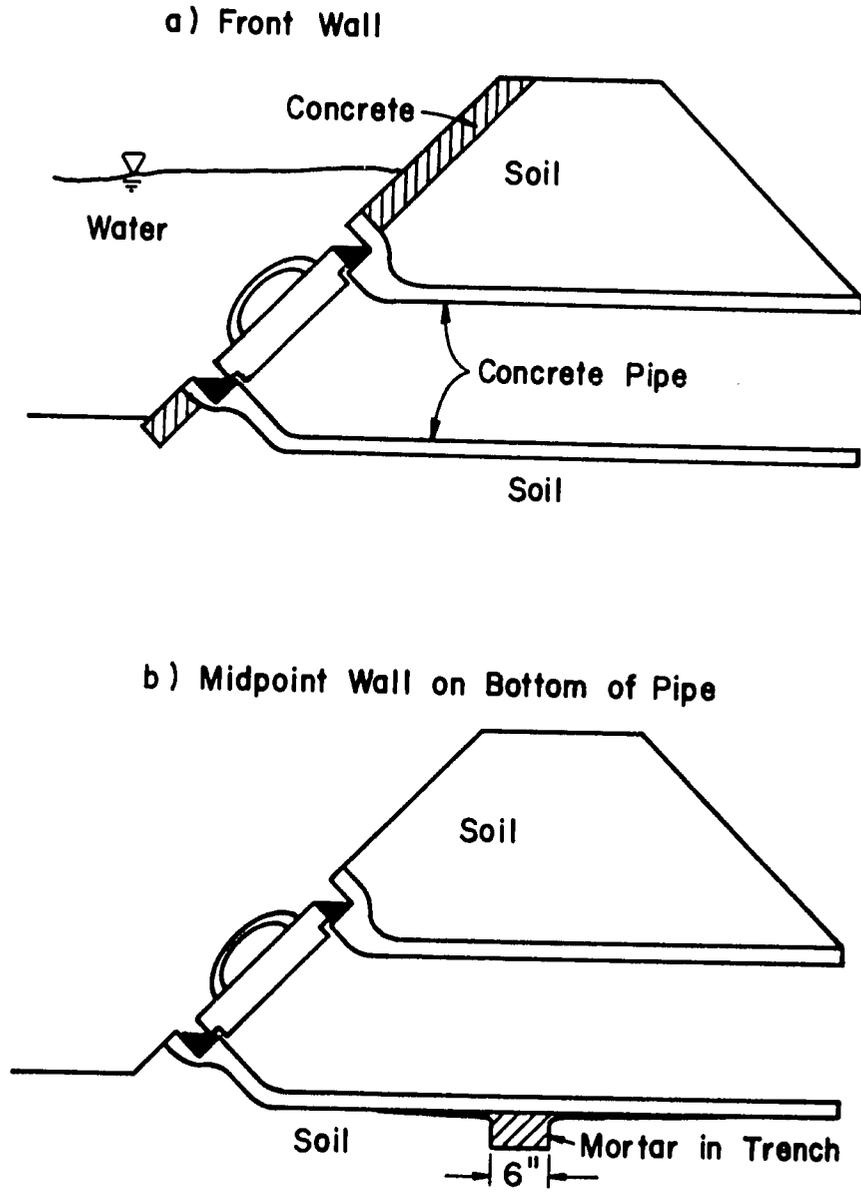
Cutoff walls to avoid washouts around pipe outlets.
